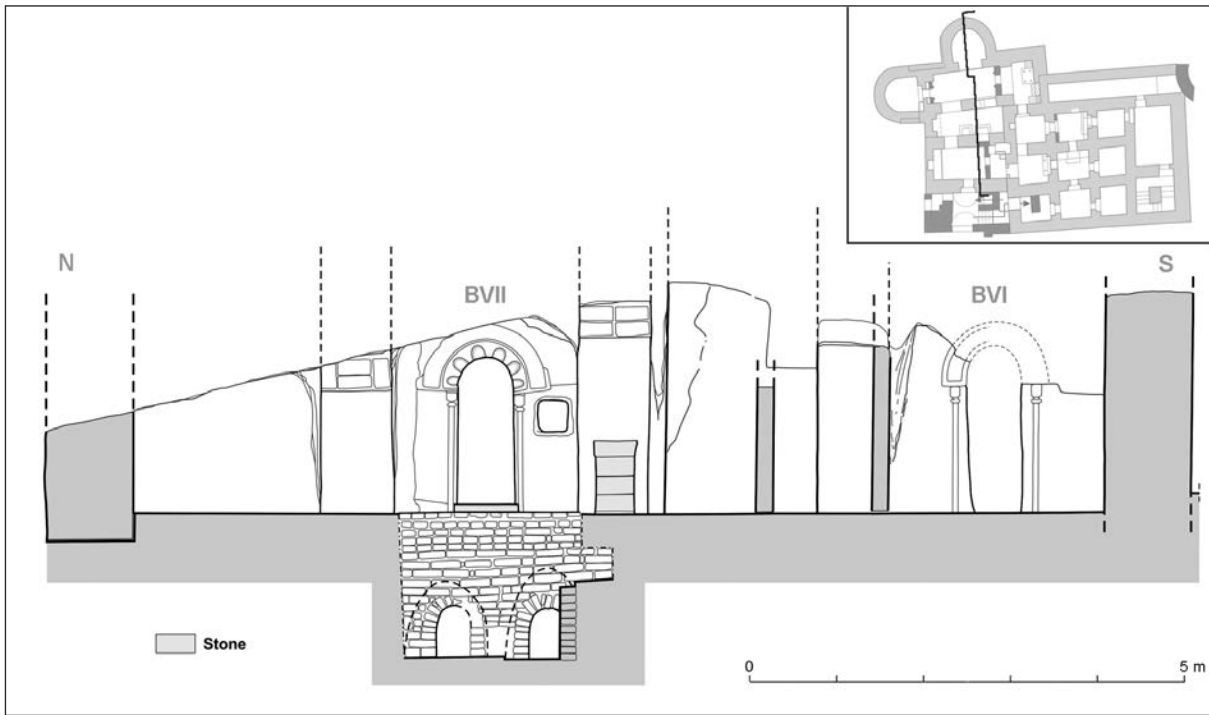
Building B.VIII: north-south section cutting in front of the altar screens, looking east; inset, Building B.VIII from the general plan
